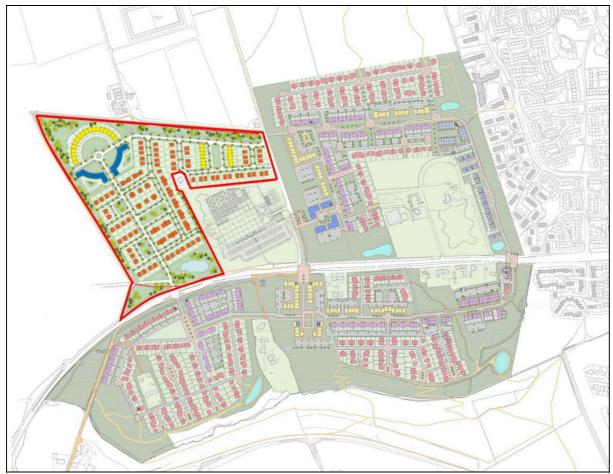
indicative plan and interface with the adopted Maidencraig masterplan area.
